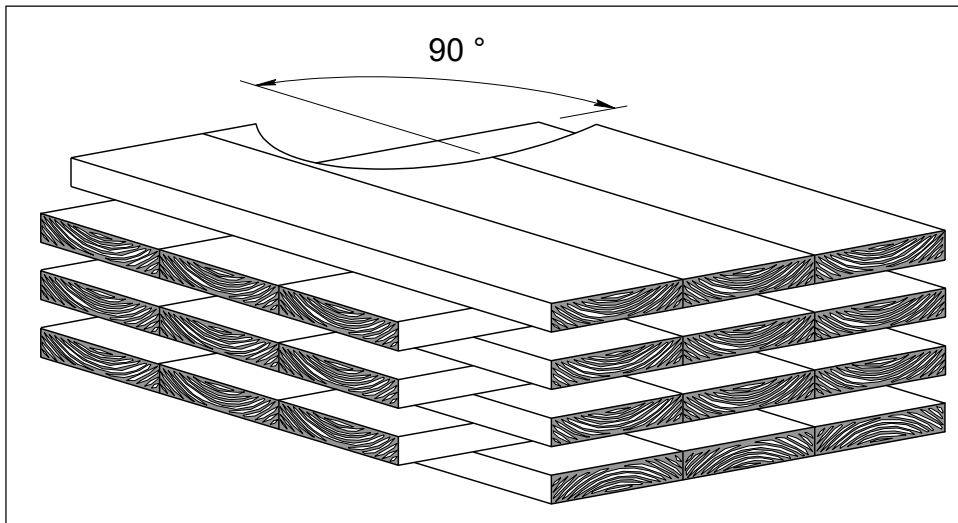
Structure of the solid wood slab (e.g. cross laminated timber with 7 layers)
